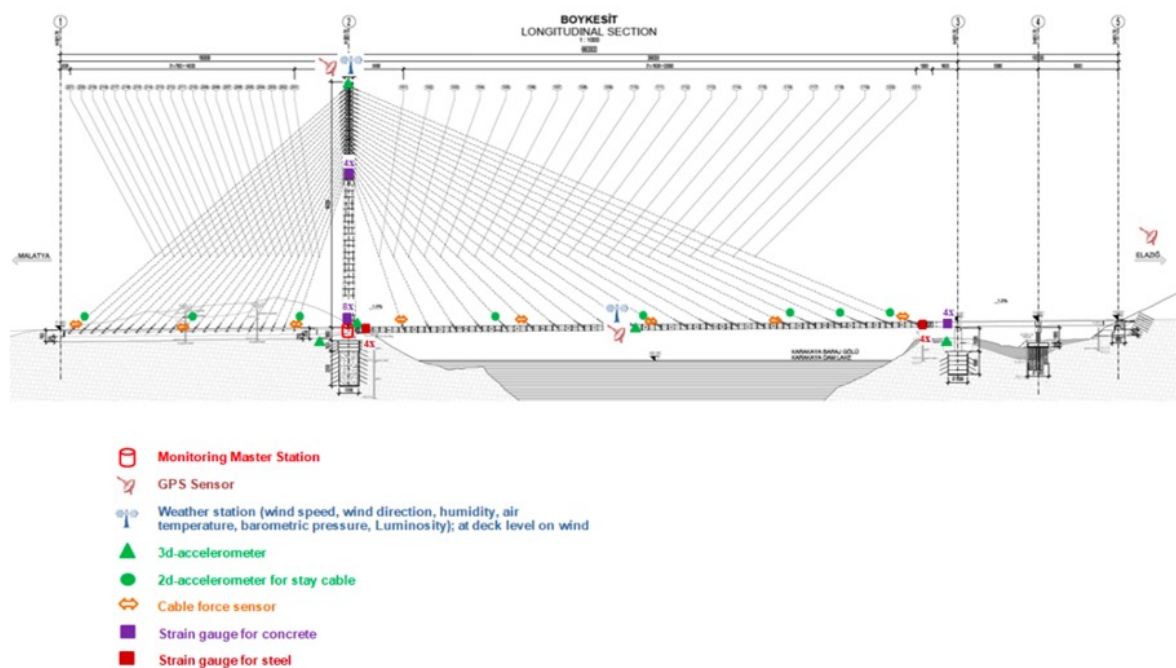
Existing SHM system of New Kömürhan Bridge.
